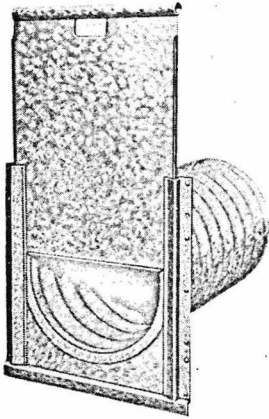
Sheet steel gate on end of short section of corrugated steel pipe.
